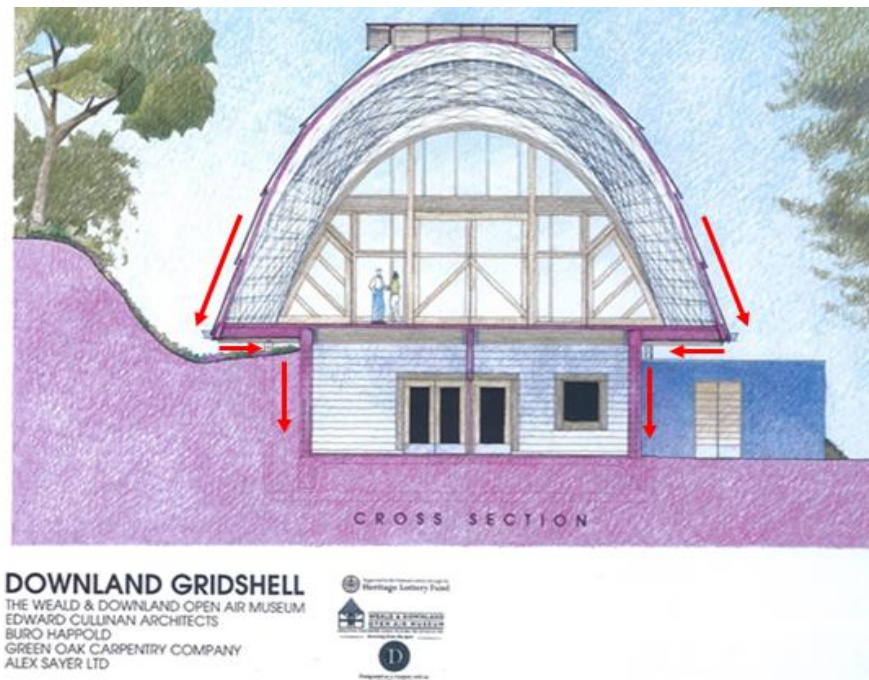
Existing timber gridshell transfers load and stabilized by a floating timber floor that transfers load onto the concrete plinth.
